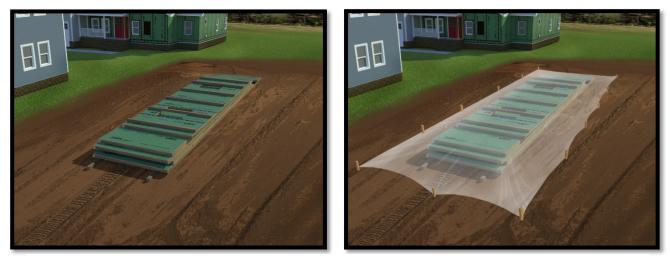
Wall sections stacked to prevent wall bowing, away from water drainage, and tarped for longer storage periods.
